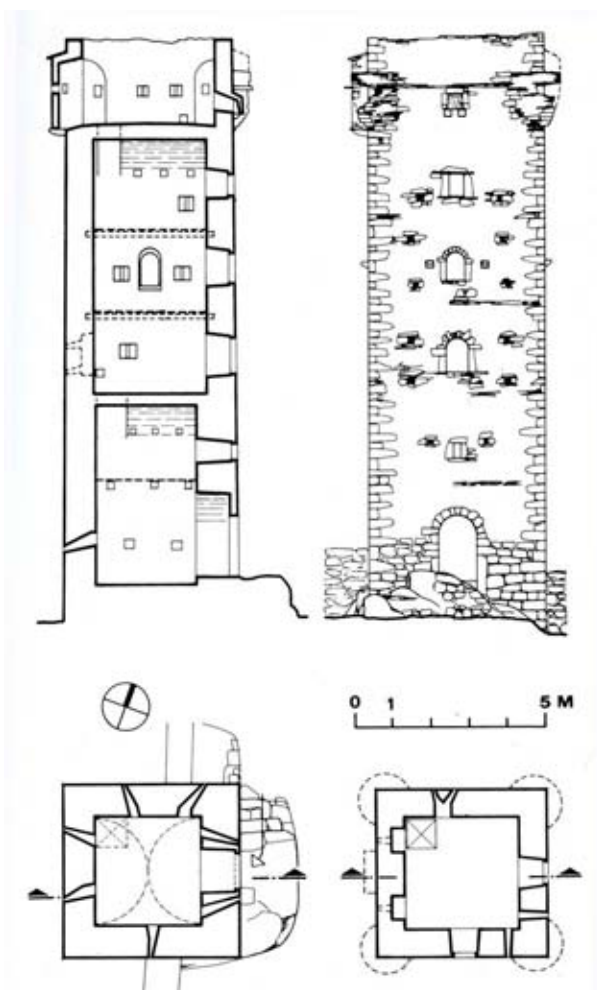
The Kapitsinos war tower in Lagada. Below: left, ground floor plan; right first floor plan. Above: left, section; right, south façade. (Saitas, 2001)
